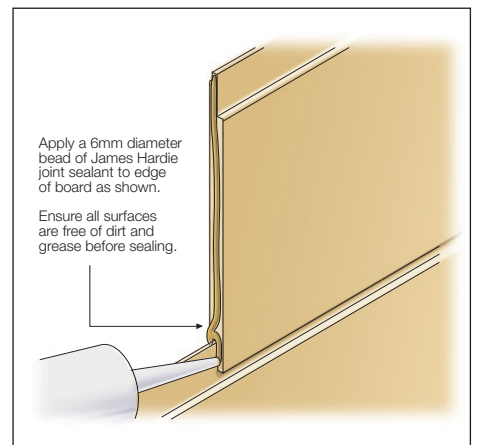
SEALING EDGE OF BOARD (STEP 1/2)
